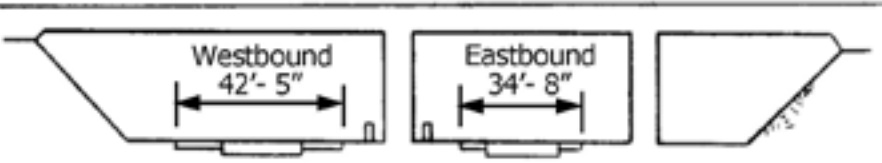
Bridge elevation view of horizontal clearances for highway feature carrying mainline and ramp traffic below the bridge.
